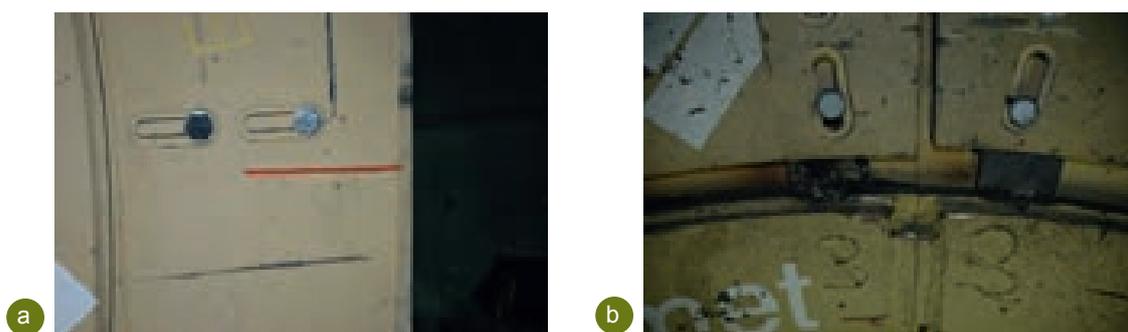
(a) The cutting edges can move forward and backward in a sleeve; (b) steel plates are placed between the cutting edges and the shield to prevent the cutting edges moving back.
